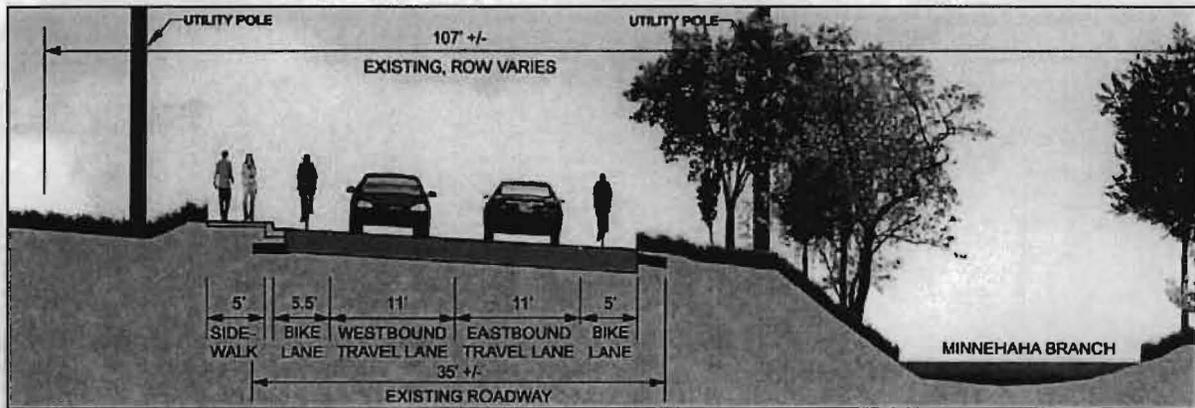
Typical Section for Alternative 2 (Preferred Alternative)
